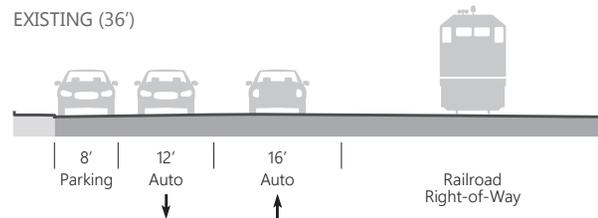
SALT LAKE AVENUE EXISTING CROSS SECTION
